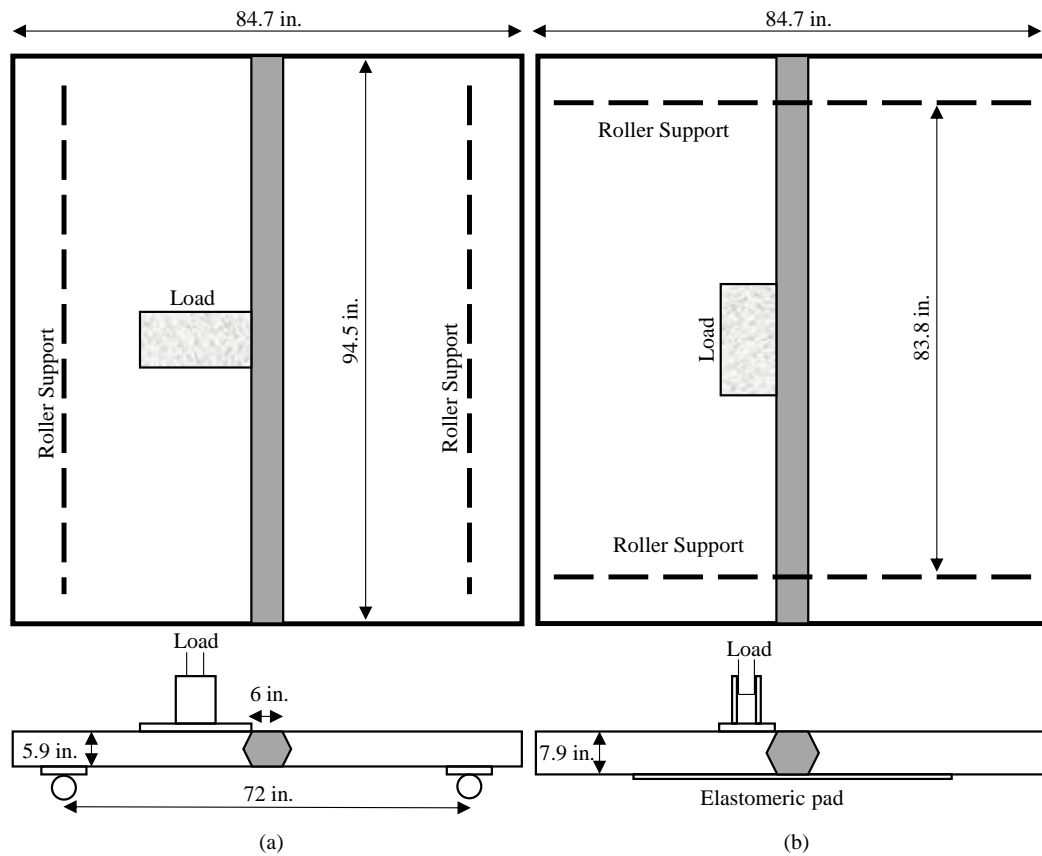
Test setup; (a) Transverse joint, (b) Longitudinal joint
